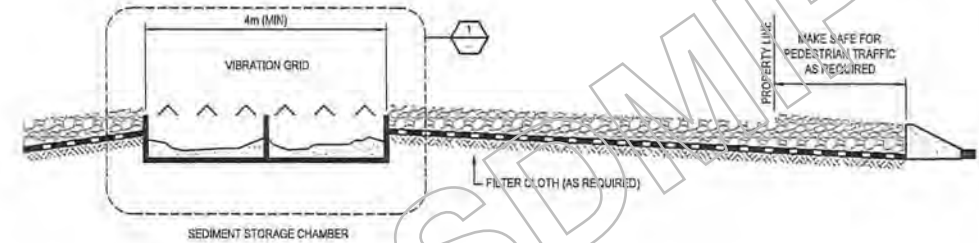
TYPICAL LAYOUT OF VIBRATION GRID WITH ROCK RAMPS
